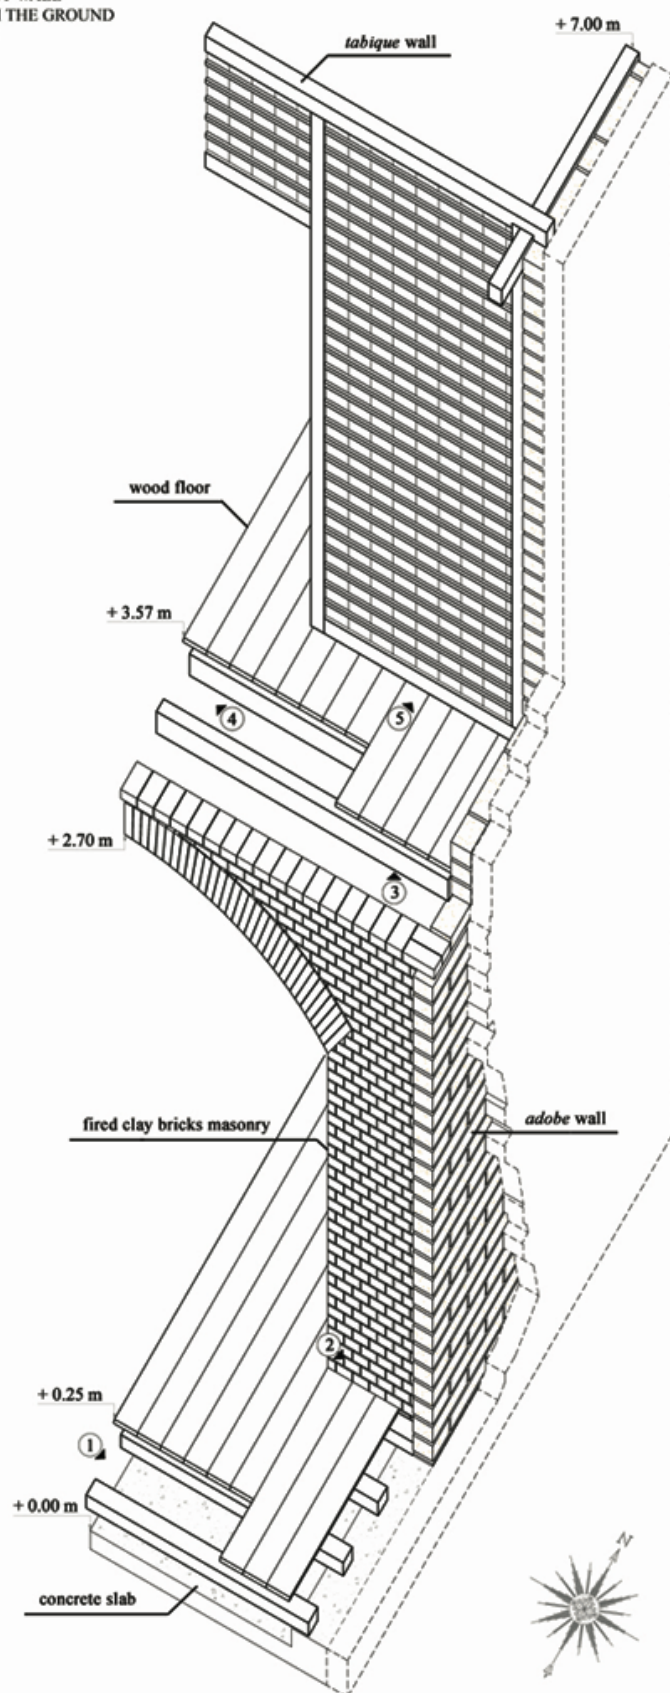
Casa Major Pessoa: sketch of the east wall's connection to the ground and first floors
